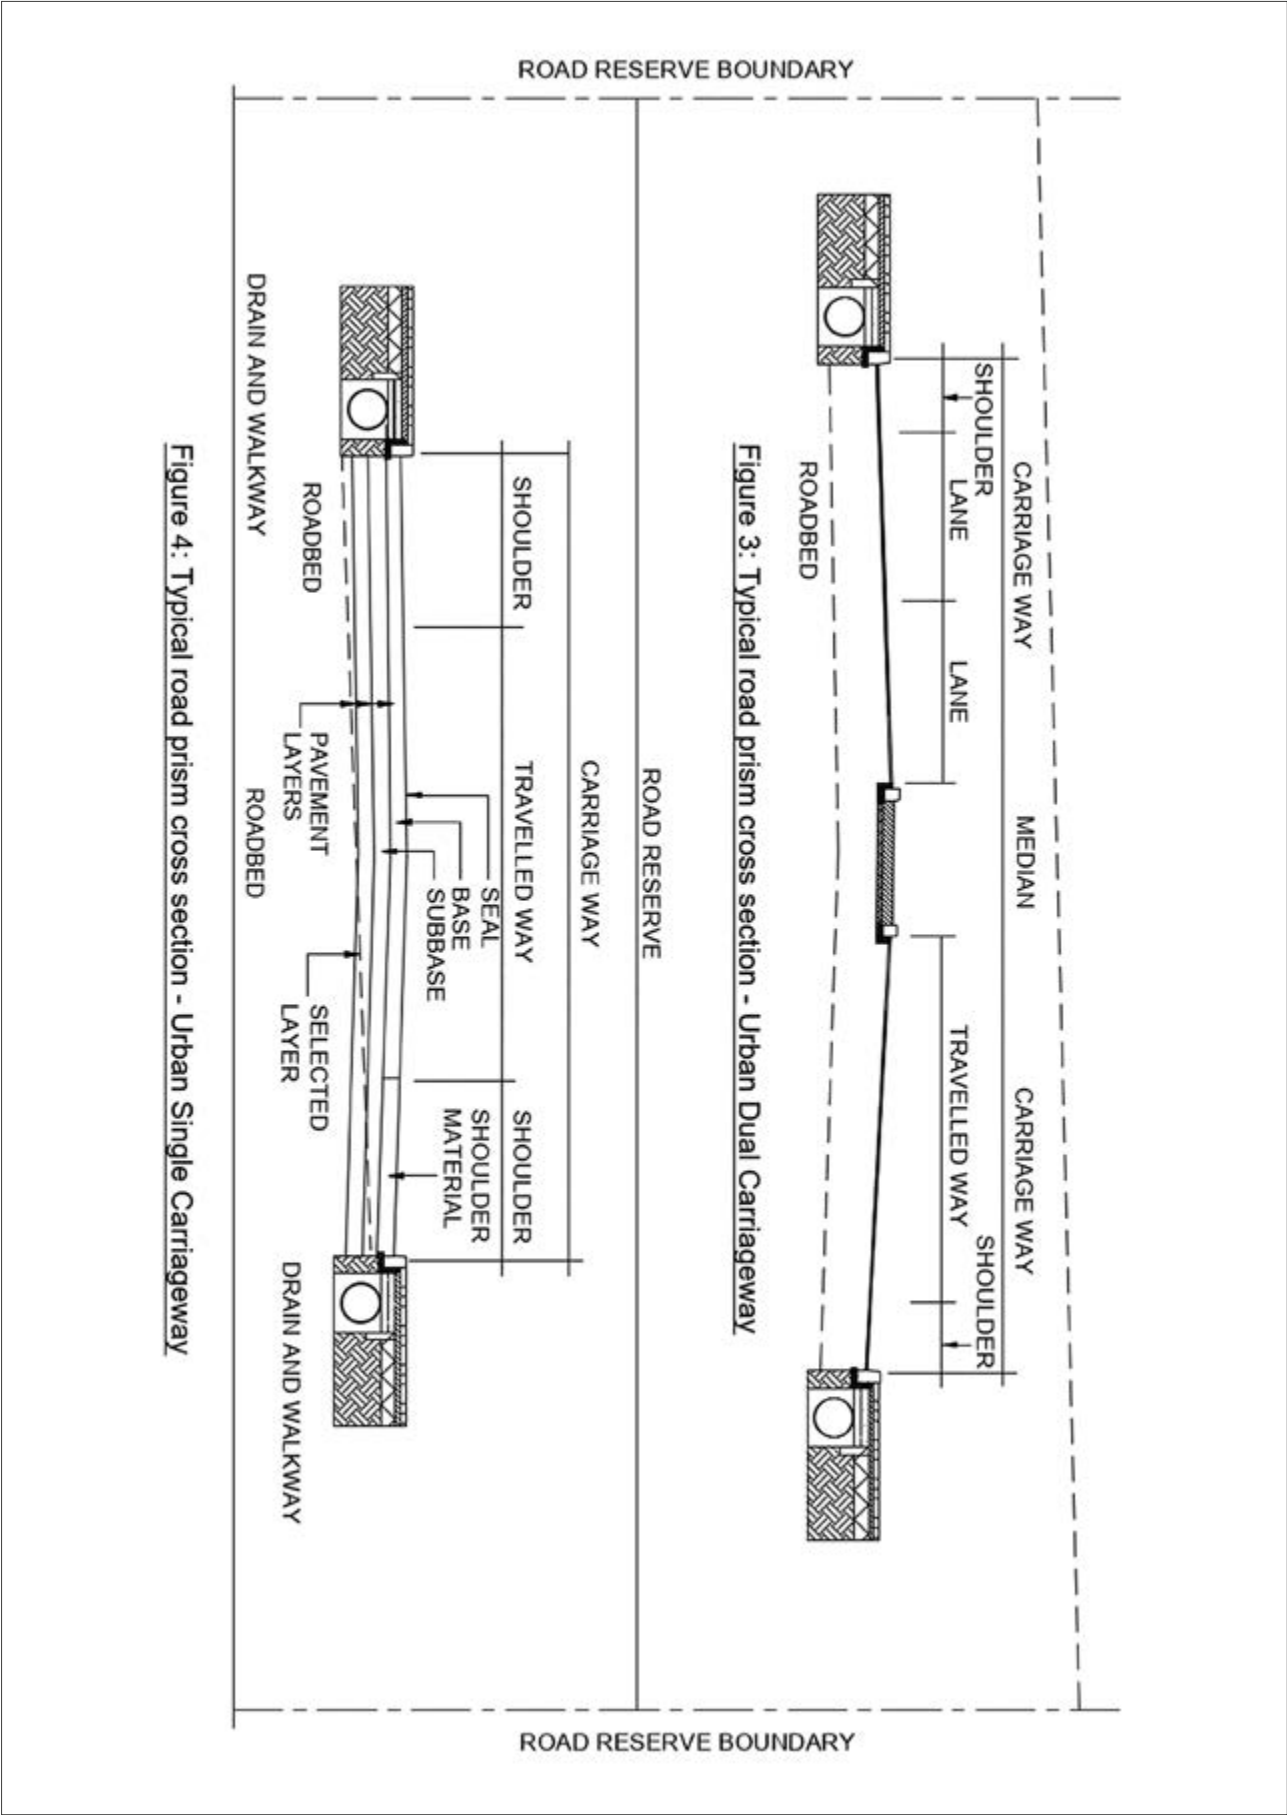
& 4 A Typical Road Cross-Section in a Urban Setting
